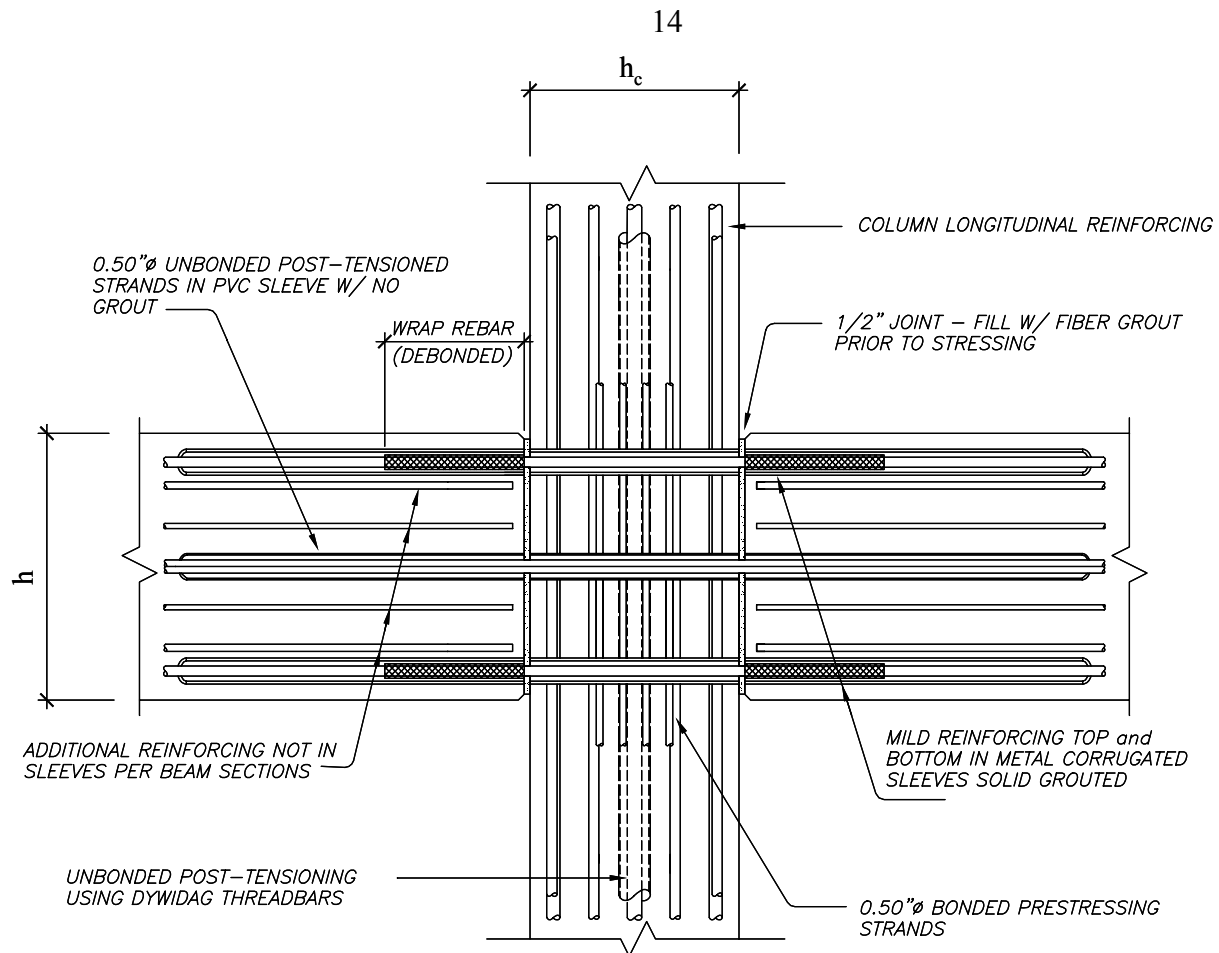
The typical connection details of a precast hybrid frame (transverse reinforcements are omitted for clarity)
